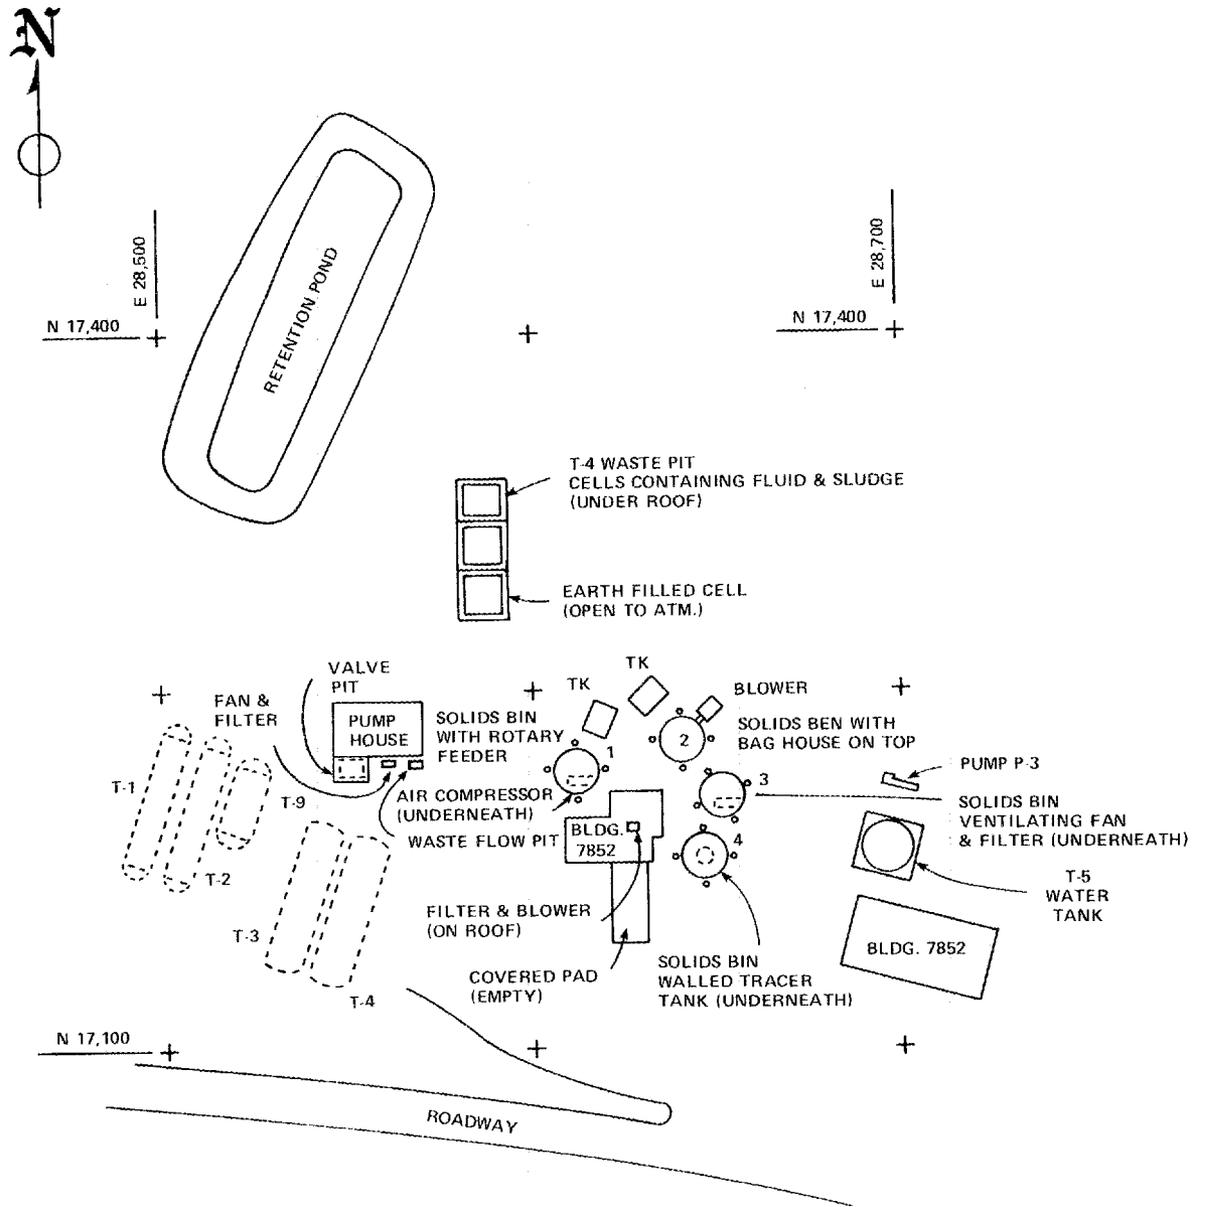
Site plan of the old hydrofracture facility.
